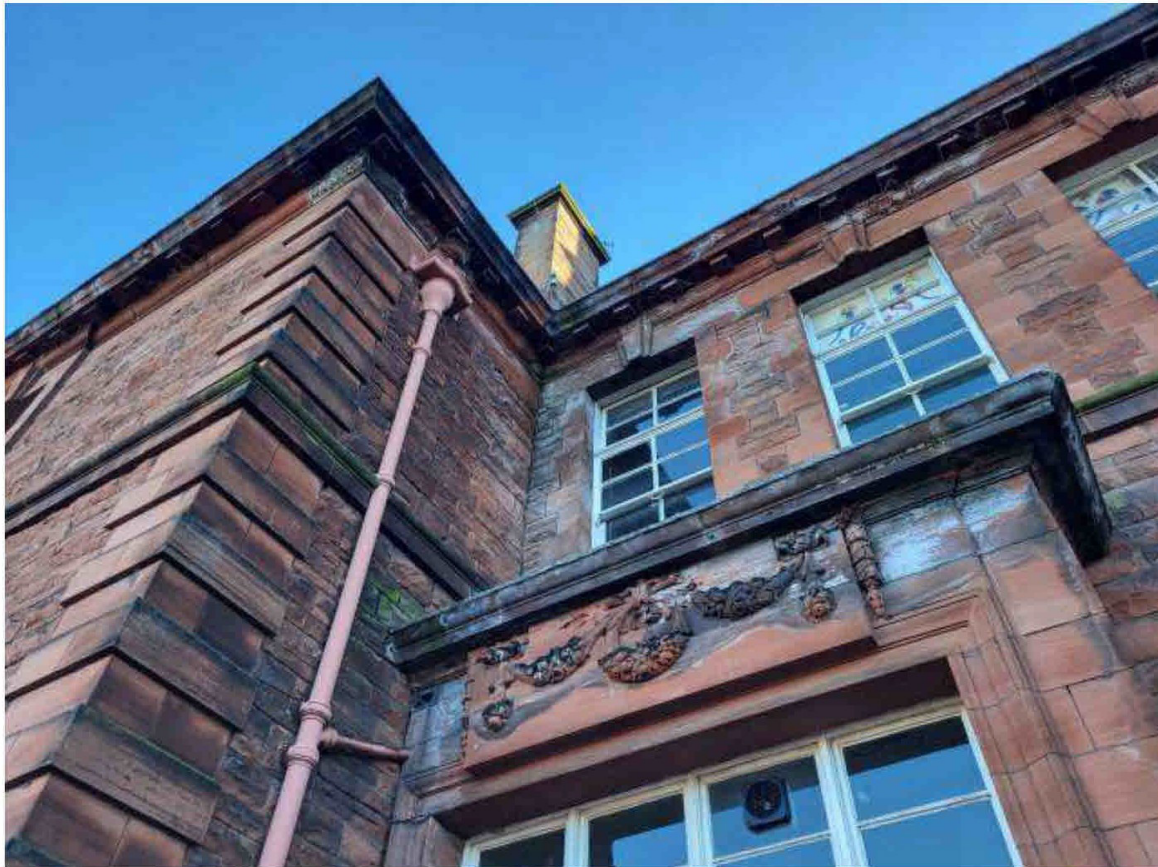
Detailed view of stone detailing above the east porch on the north-west facing elevation (© Graham & Sibbald 2025)
